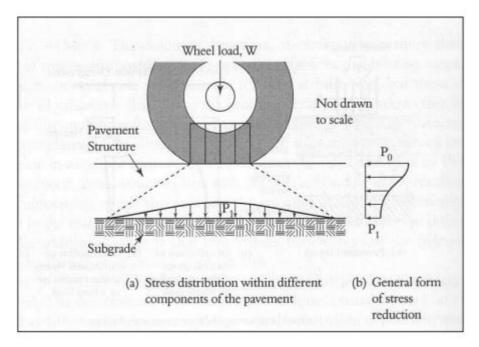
3 Spread of Wheel Load Pressure through Pavement Structure
